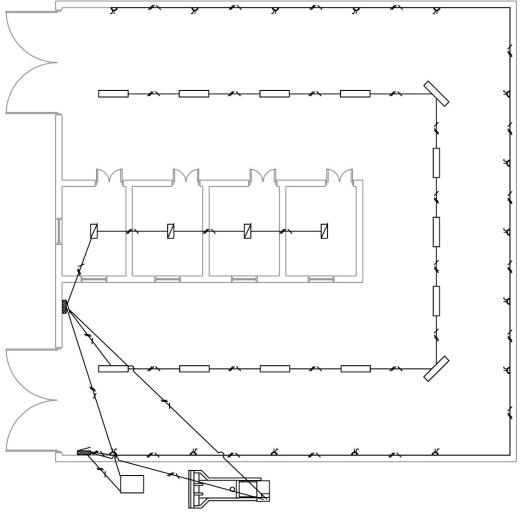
The drawing after connecting transformer and generator to the circuit
